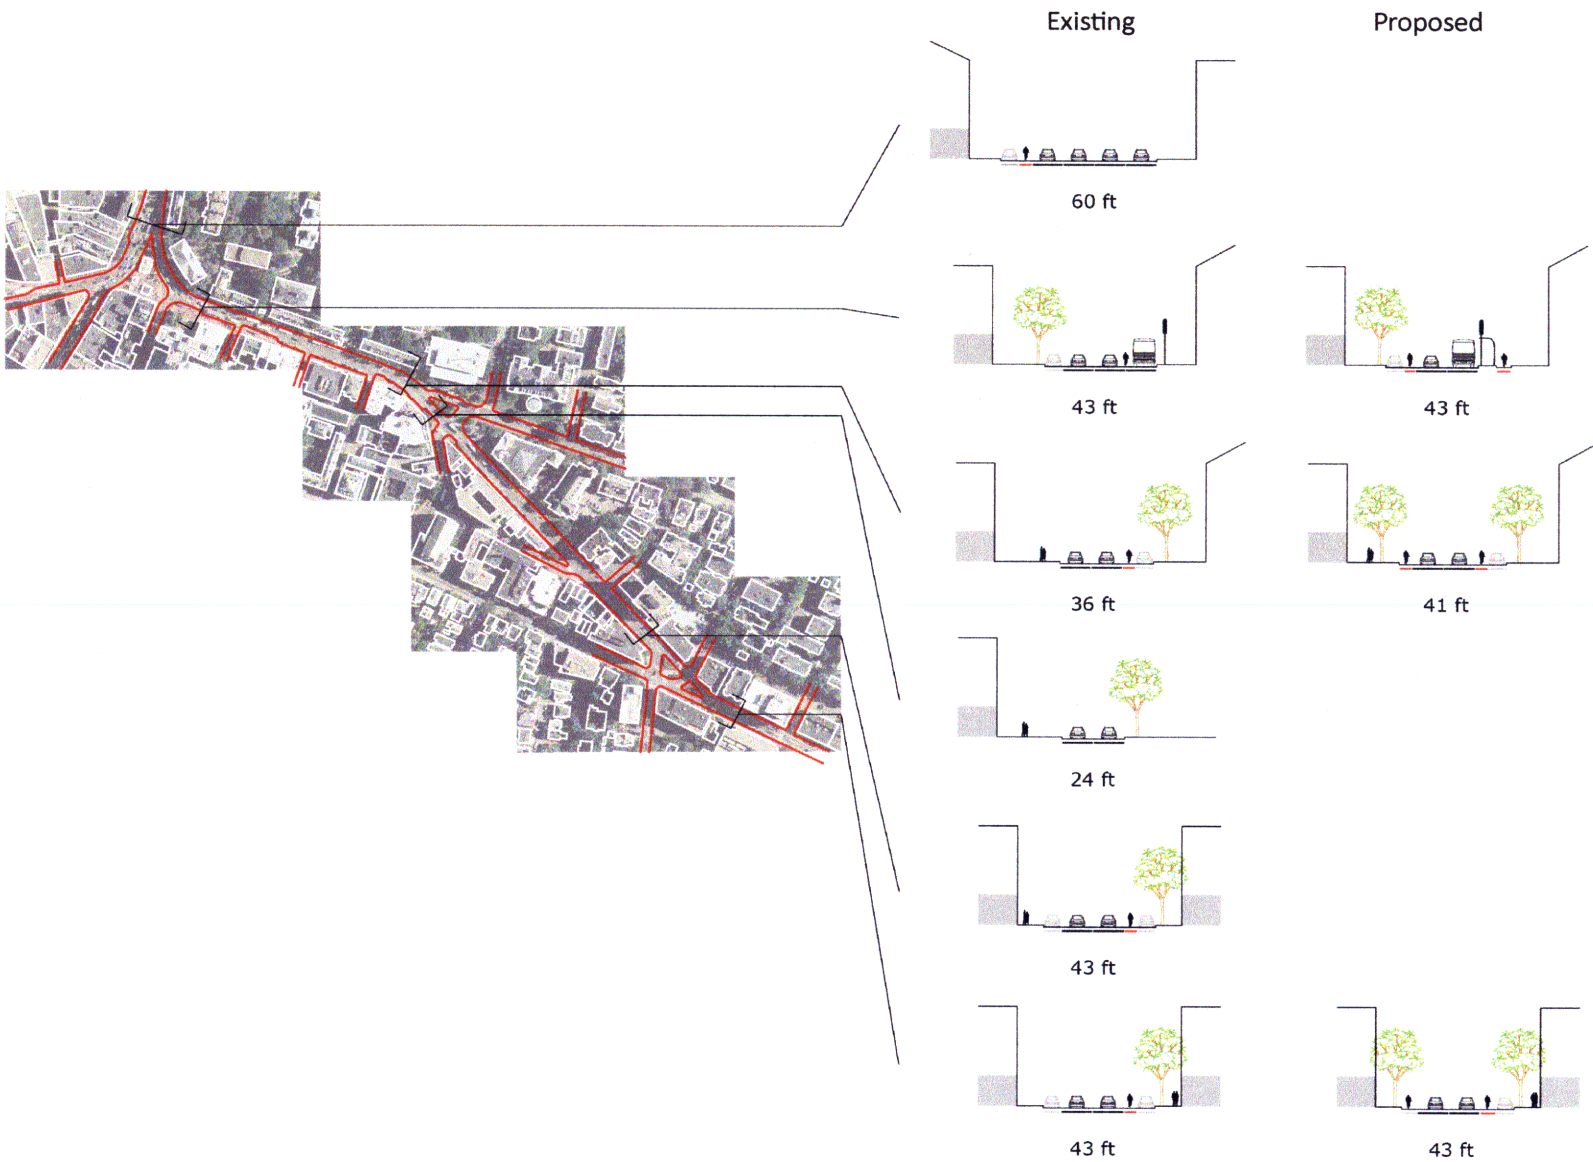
Existing and proposed street sections along Massachusetts Avenue.
